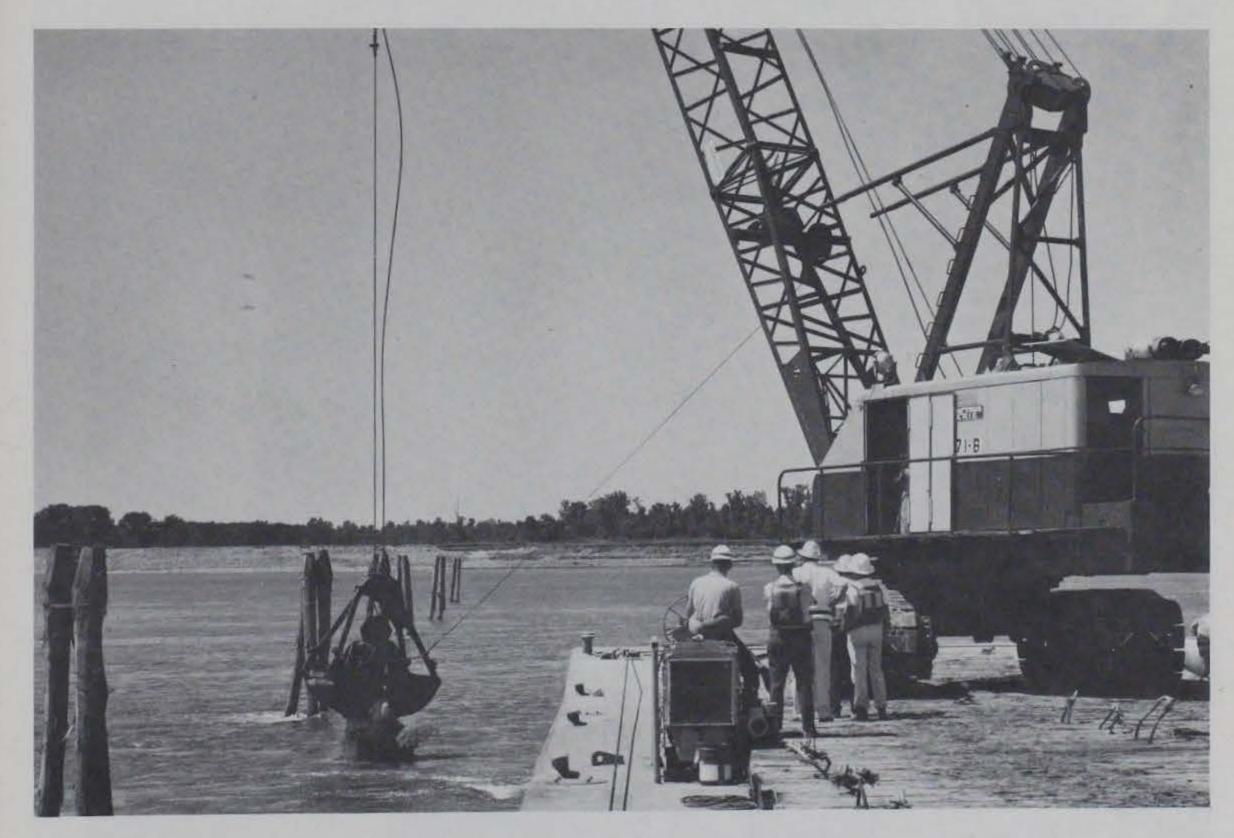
Dike No. 1 looking riverward along dike line to section where nylon and plastic bags are to be placed. Note stone base extending 400 ft beyond completed portion of dike to experimental section
